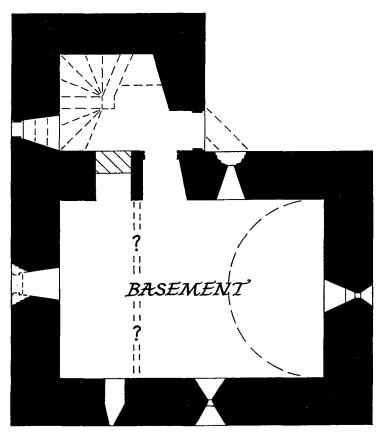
Hillslap Tower, ground-floor plan (scale 1:96)
